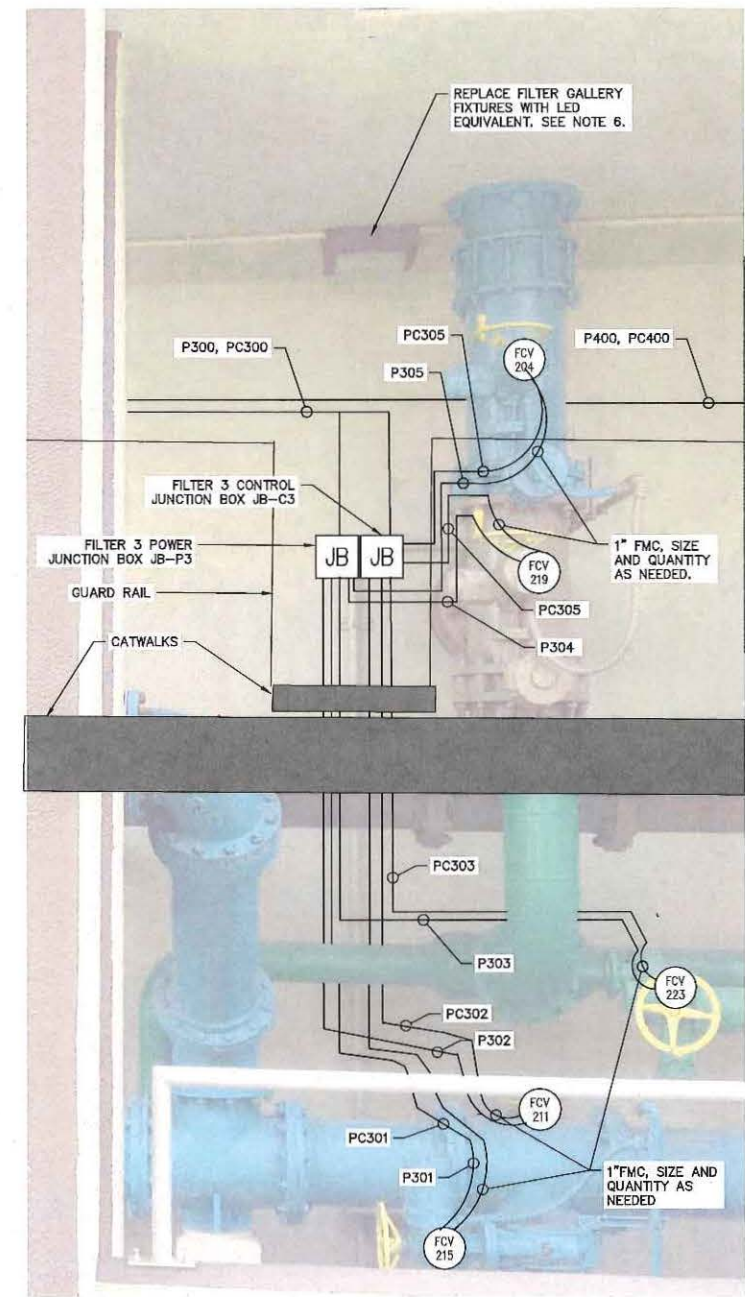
CONTROL VALVE CONDUIT PLAN DETAIL (TYP OF 4)
